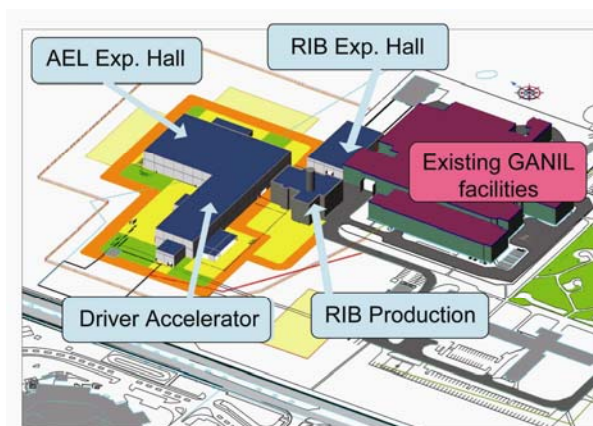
Spiral 2 new buildings (blue) and existing facilities at the GANIL site
